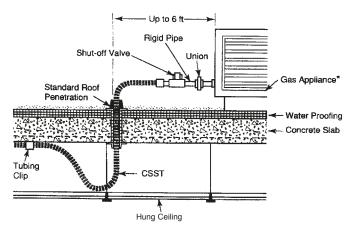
Short (1-6 foot) outdoor connection to roof mounted equipment
